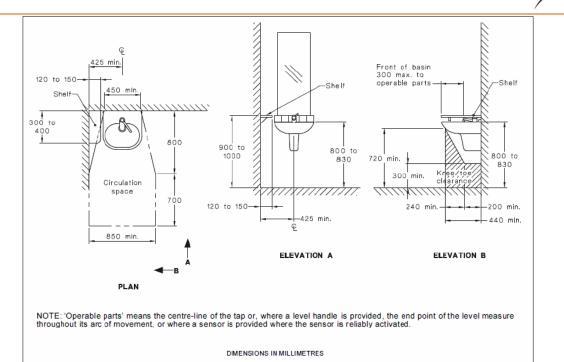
(B) WALL-MOUNTED WASHBASIN INSTALLATION—OTHER THAN FOR SOLE-OCCUPANCY UNIT
